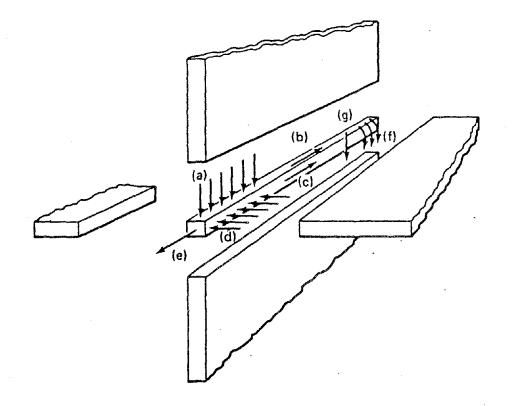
EXPLODED VIEW OF HORIZONTAL CONNECTION SHOWING FORCE ACTIONS
